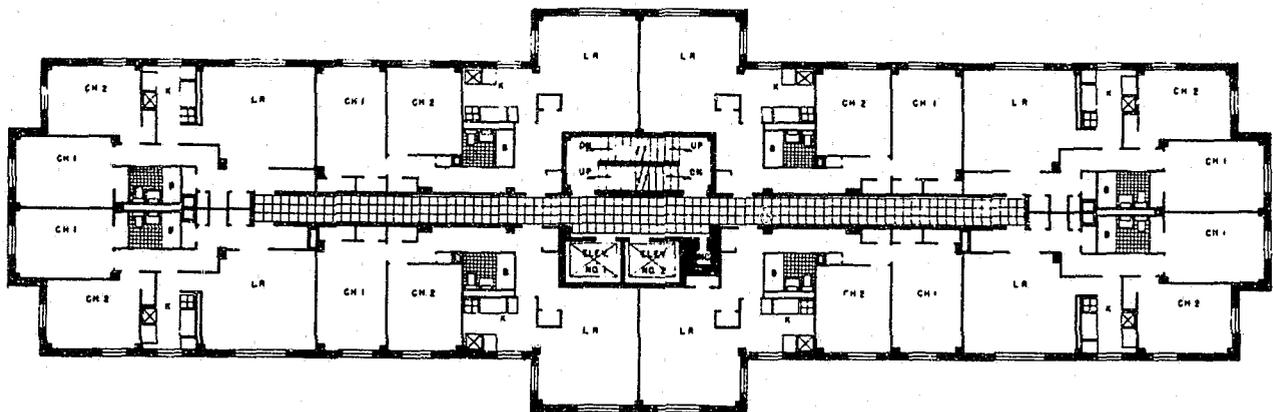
Edenwald Houses, New York. Typical floor plan.
